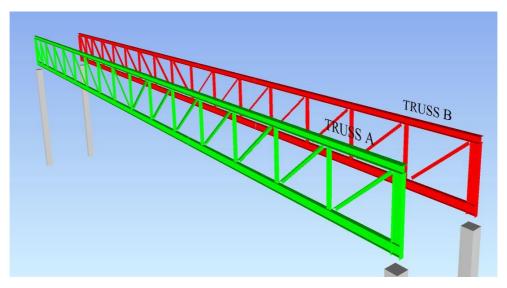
Truss A & Truss B are duplicate vertical load bearing trusses
